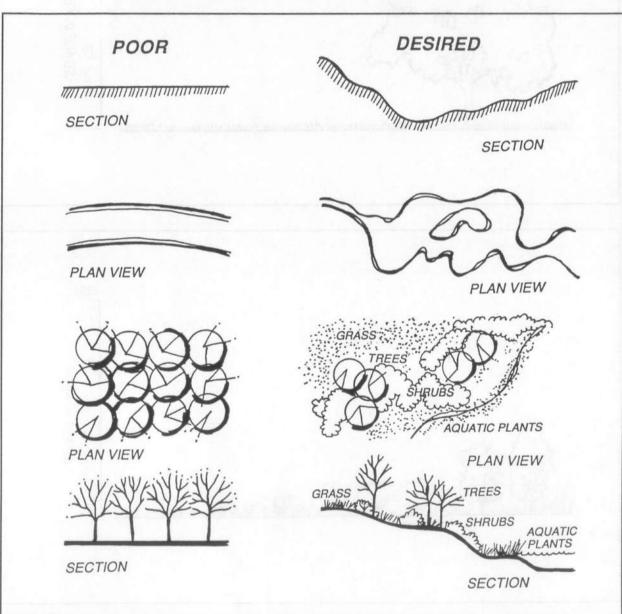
Examples of Poor and Desired Arrangements of Plantings.
